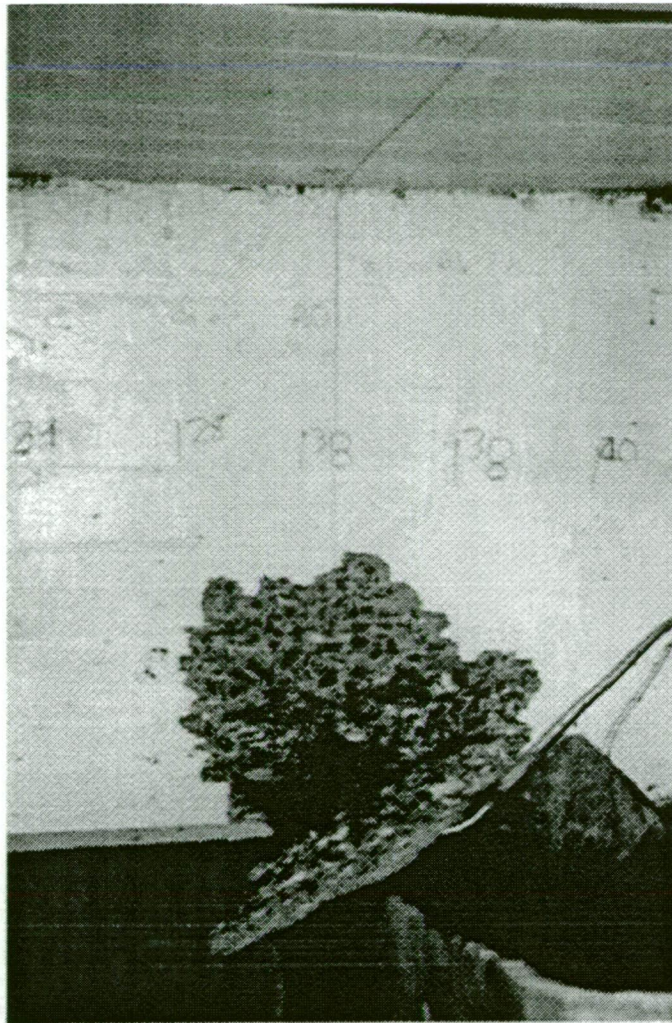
Spalling of Beam at Abutment at Ultimate Load
